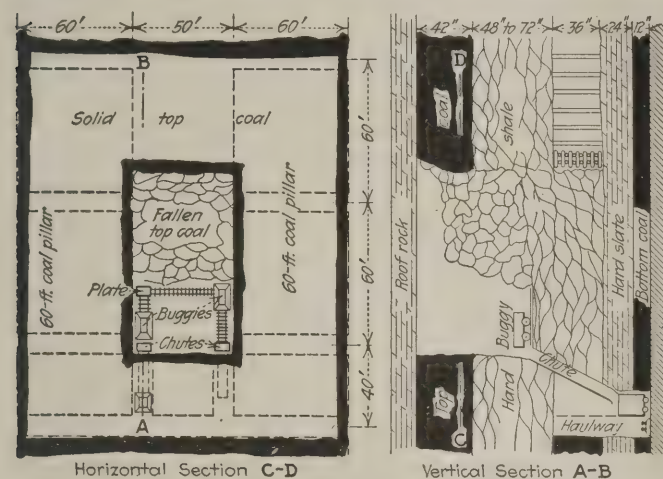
PLAN AND ELEVATION WORKING OUT TOP COAL
